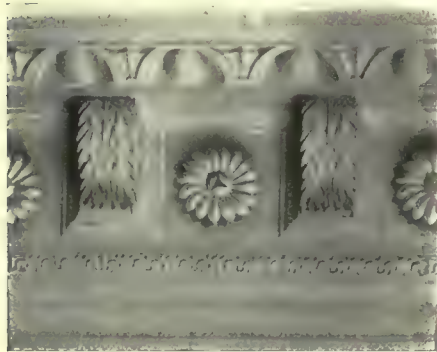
Cornice Detail of White Room, Westwood Park.
